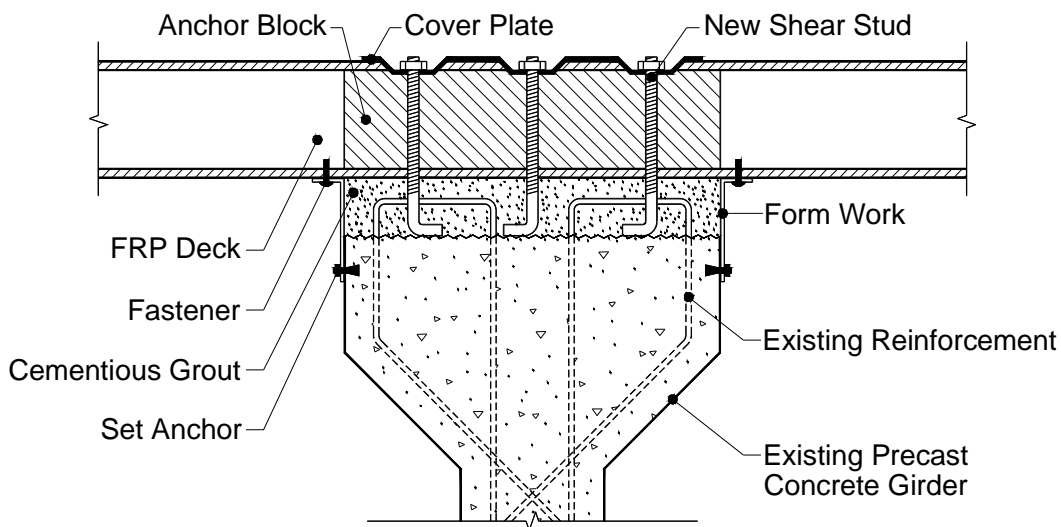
Schematic of Proposed Deck-to-Girder Connection
